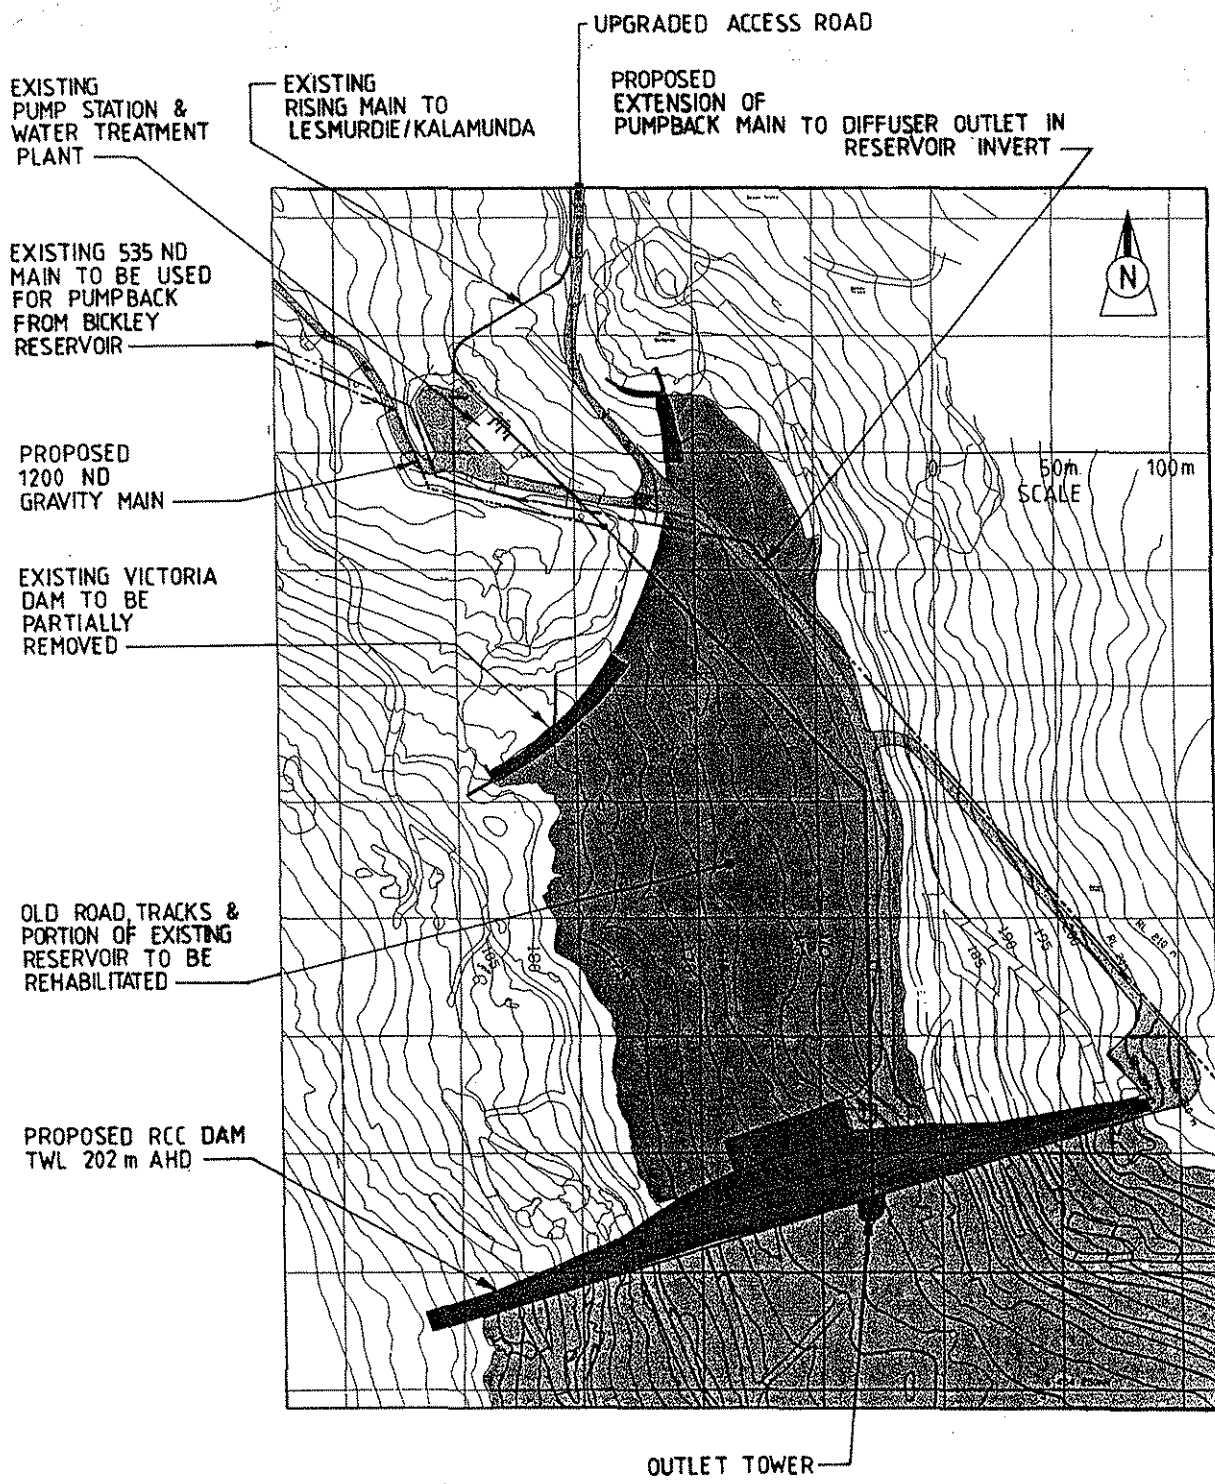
General arrangement of the new Victoria Dam, indicating location of old and proposed new dam walls
